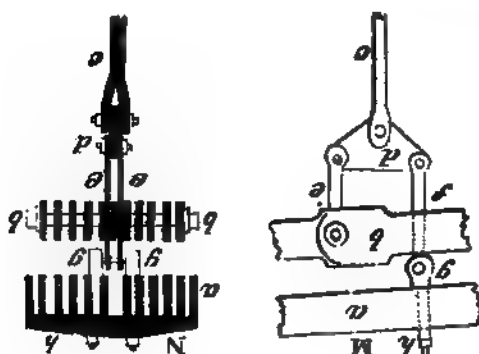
Shows an elevation M and cross section N of the connection between the main-chains and suspending-rods.
